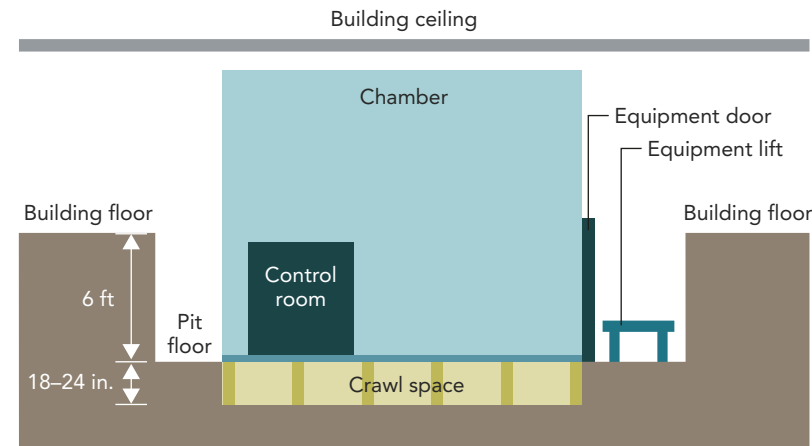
One chamber design needed a 6-ft pit to clear a building's ceiling.
